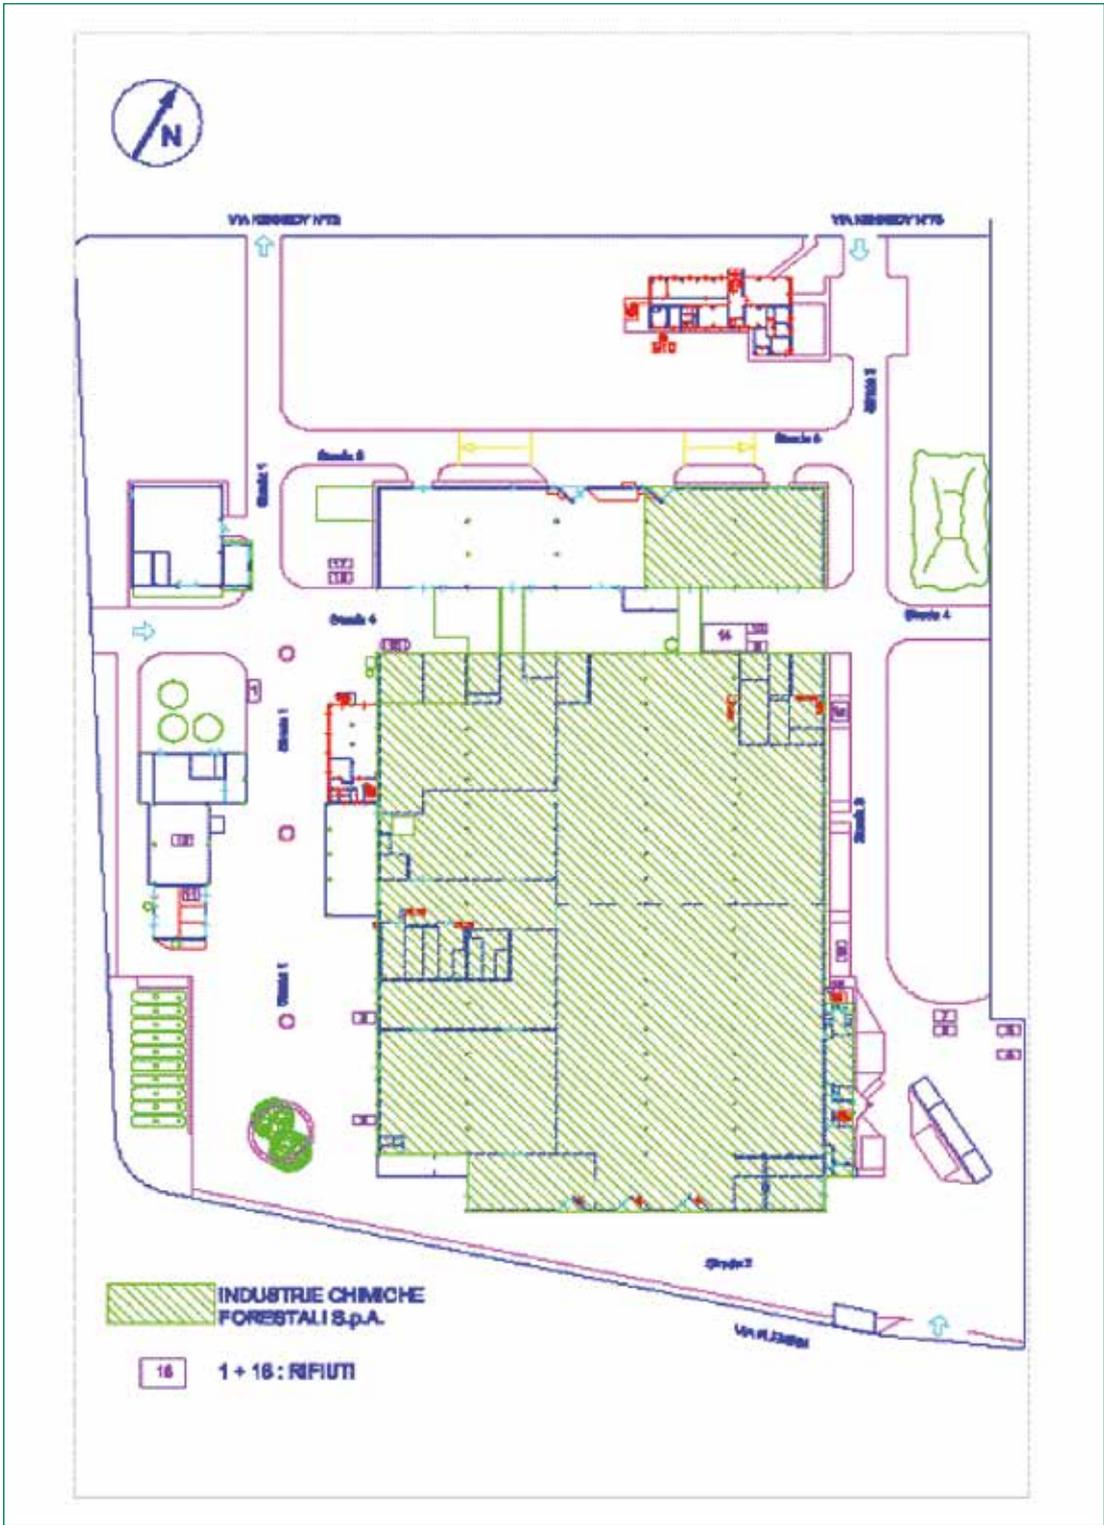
Plant layout showing collection points for separate waste collection (Scale 1:1600)
